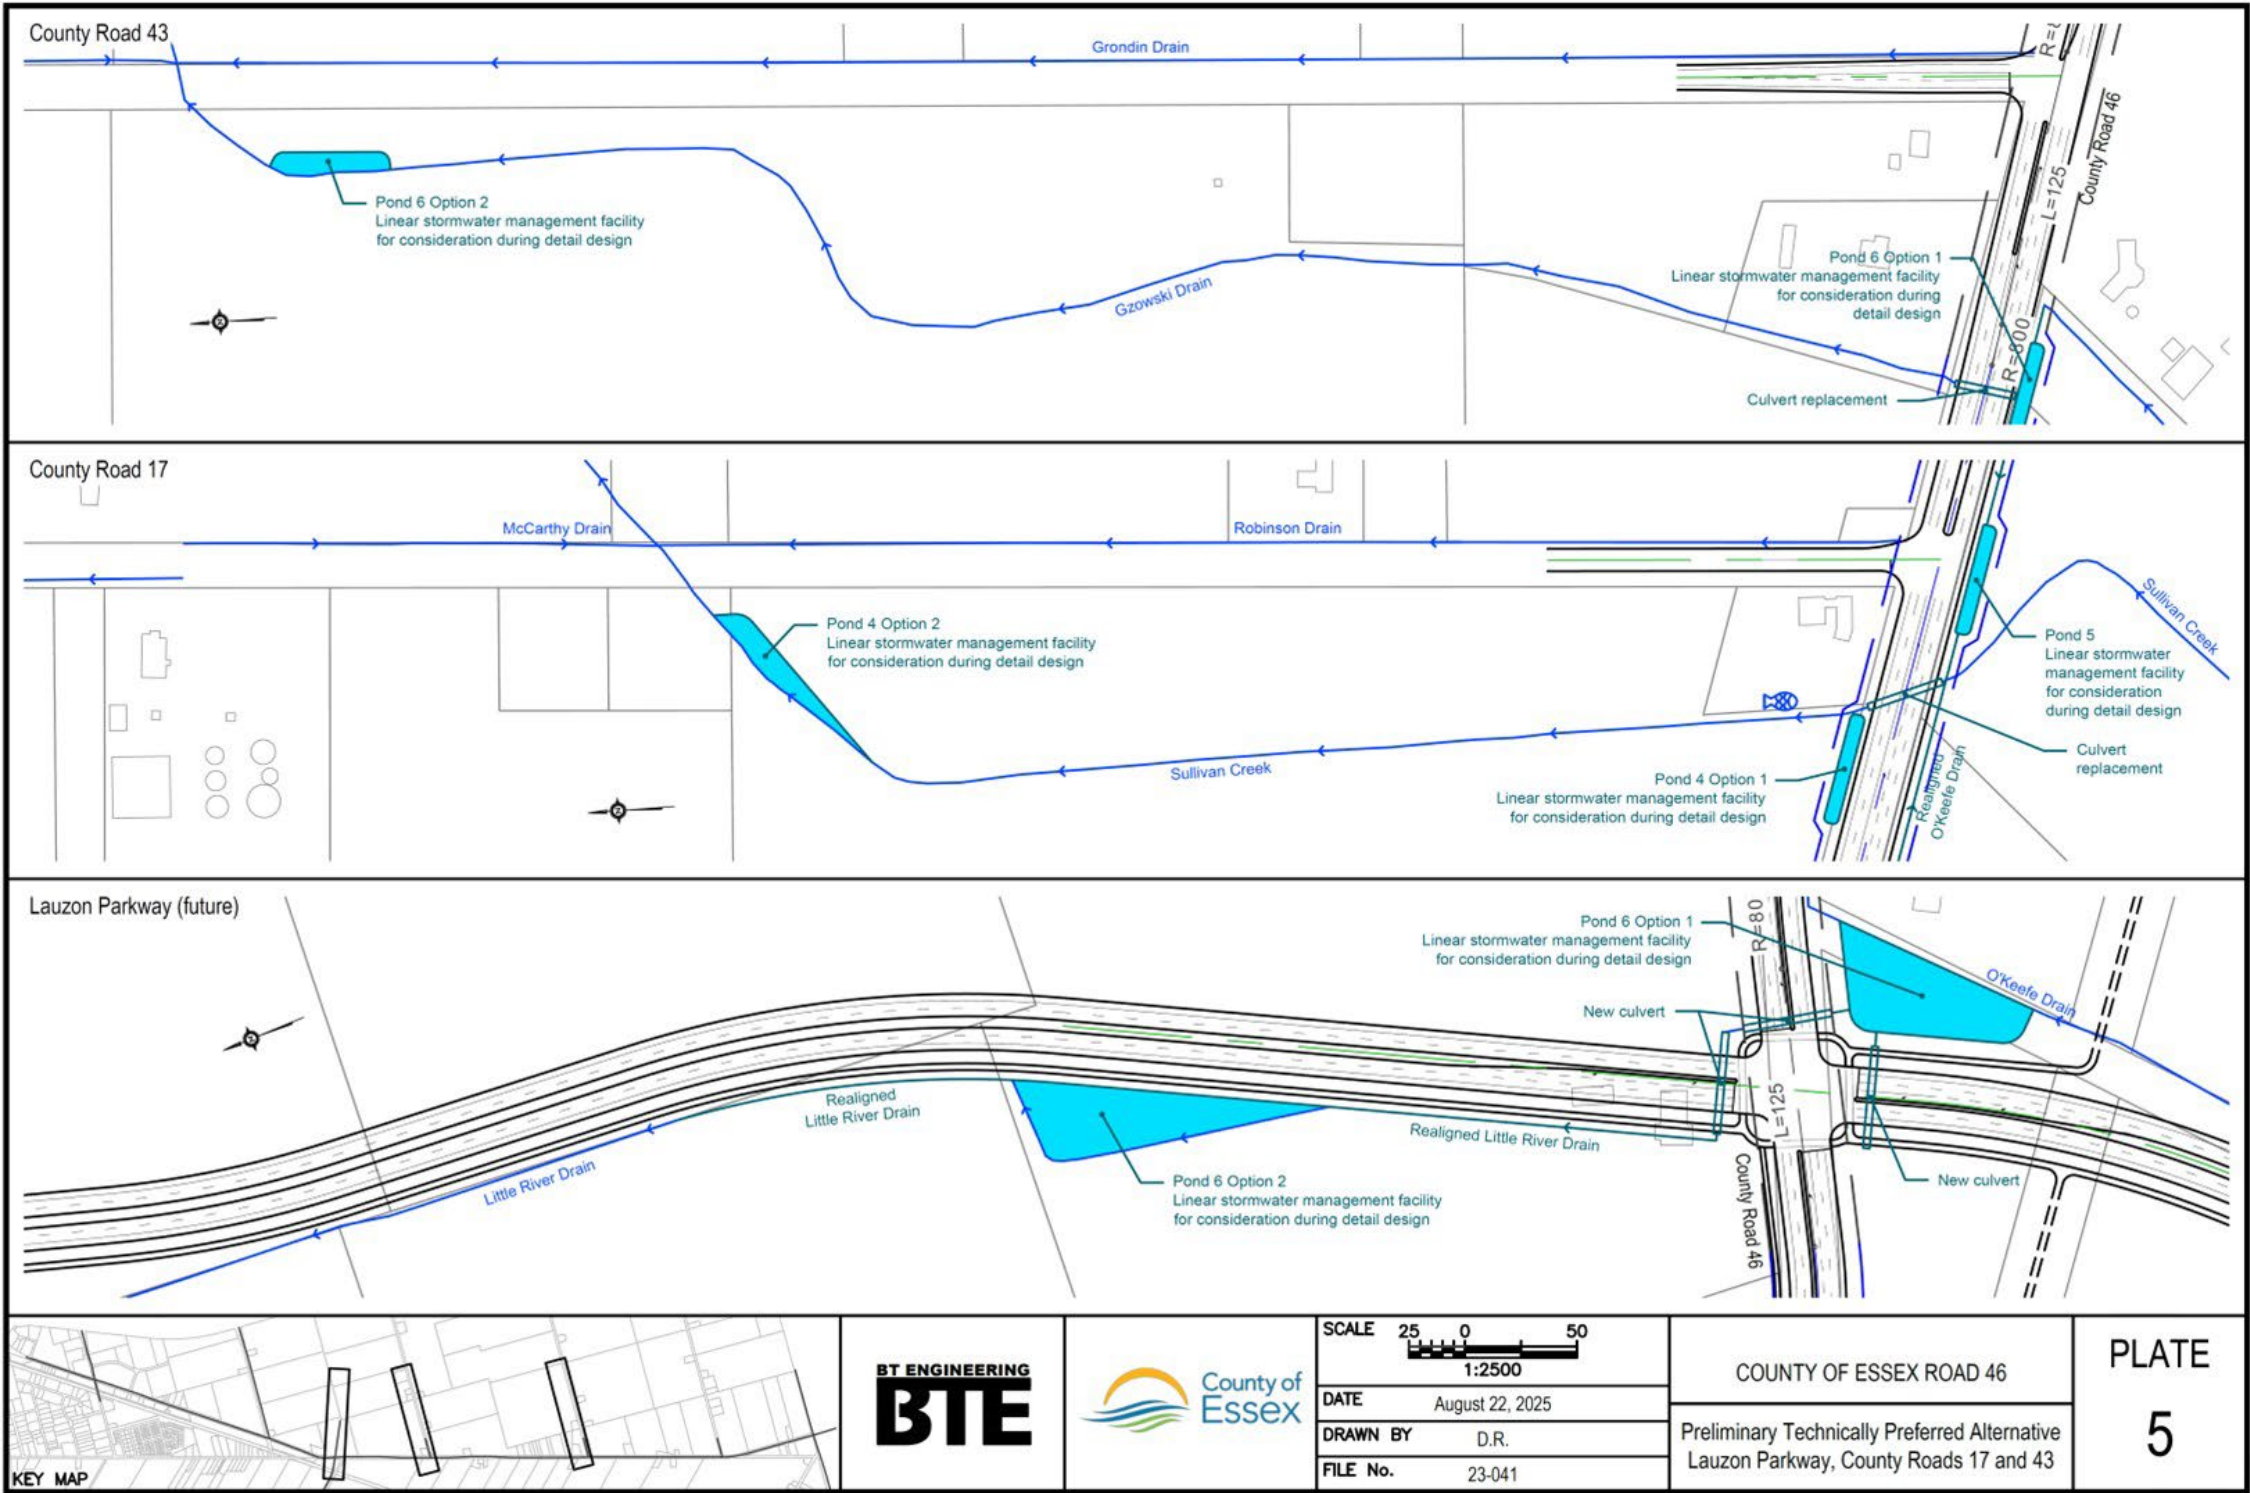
County Road 43, County Road 17 and Lauzon Parkway Recommended Plan
